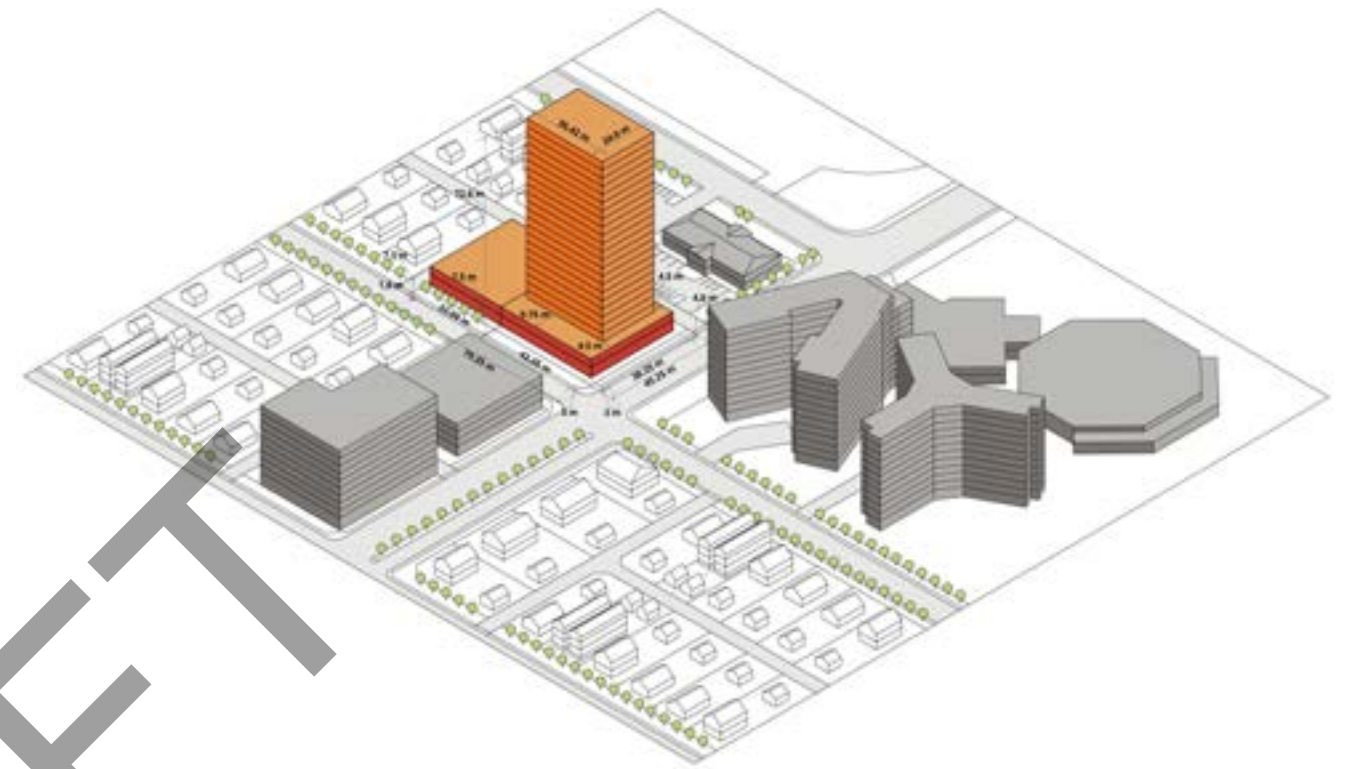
Concept Massing Model – 24 Storey Building (2 Storey Podium)
